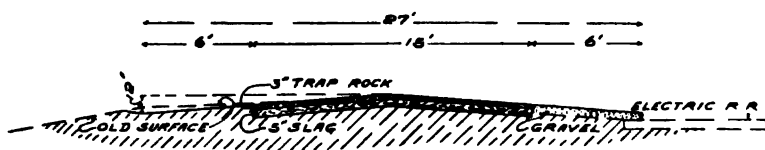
Typical cross-section of Eastern avenue, Baltimore county, showing macadam construction with slag foundation and trap-rock top course.
